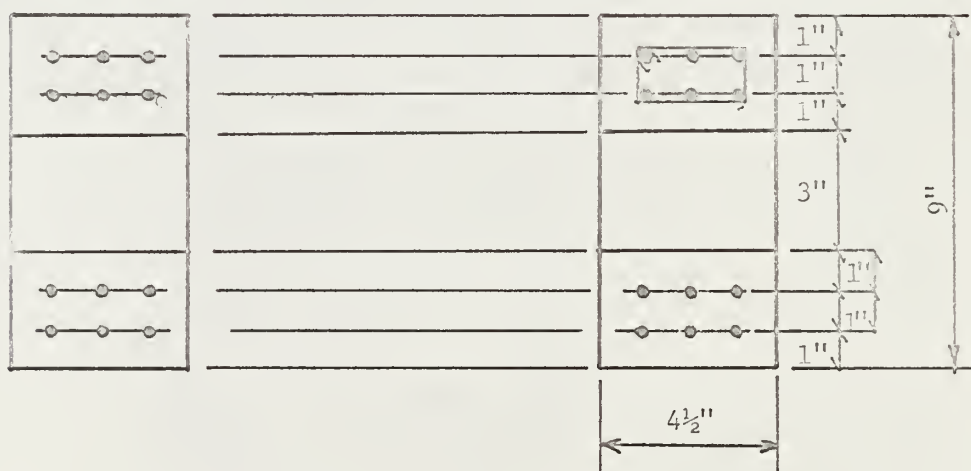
DIMENSIONS AND REINFORCEMENT DETAILS OF TEST BEAMS.
